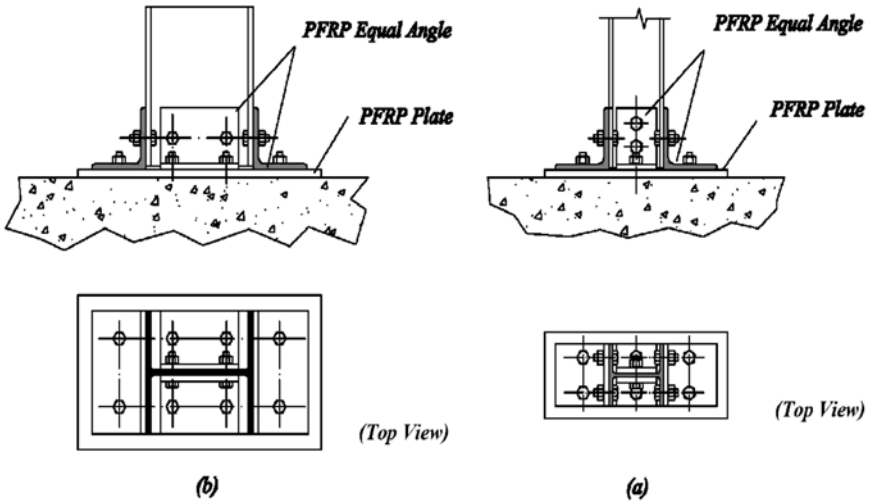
Column-base connection details tested by Turvey and Cooper. A, 8 in. × 8 in. × 3/8 in. (203.2 mm × 203.8 mm × 9.5 mm) H-profiles; B, 4 in. × 4 in. × 1/4 in. (101.6 mm × 101.6 mm × 6.4 mm) H-profiles. Source: Turvey and Cooper (1998).
